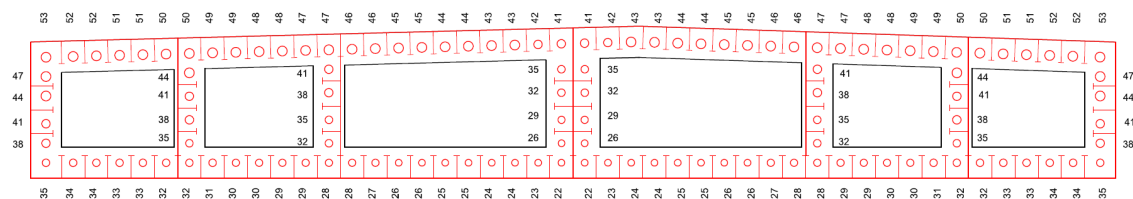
Post-tensioning arrangement at the joint in abutment North (showing number of 0.6" strands per tendon). Center distances are 600 mm for PT as well as for stiffeners.
